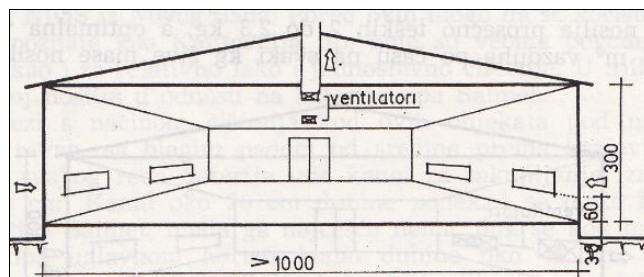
Cross-section of a poultry house with a ceiling (Petrović, 1988) ^[33]
